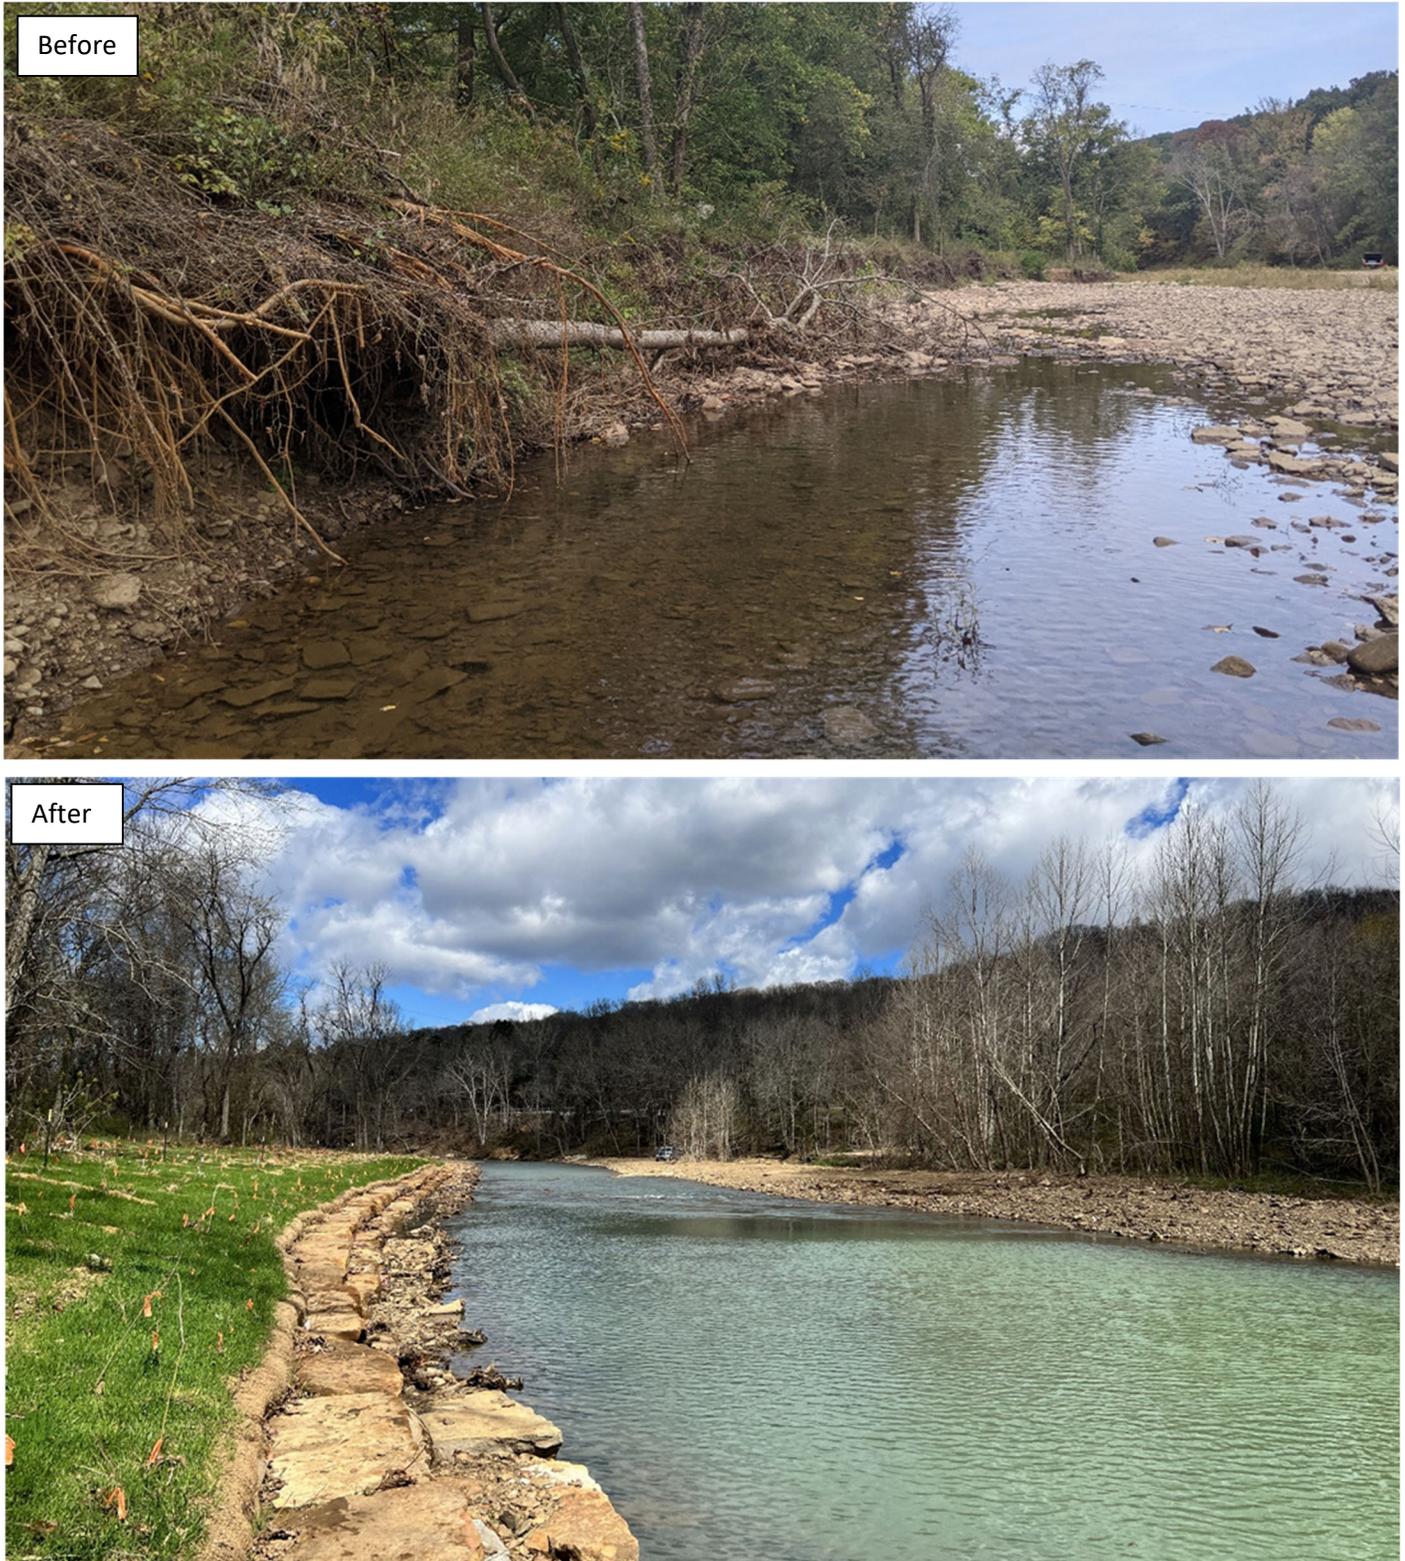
The upstream cut bank before and after restoration. The upper photo shows the eroding streambank prior to restoration. The lower photo shows the constructed riparian bank with a toewood bench, stack rock, and a soil mattress filled with native species of trees, shrubs, grass, and forbs. The bright green aspect of the bank at this point is due to winter wheat sprouting as a cover crop.
